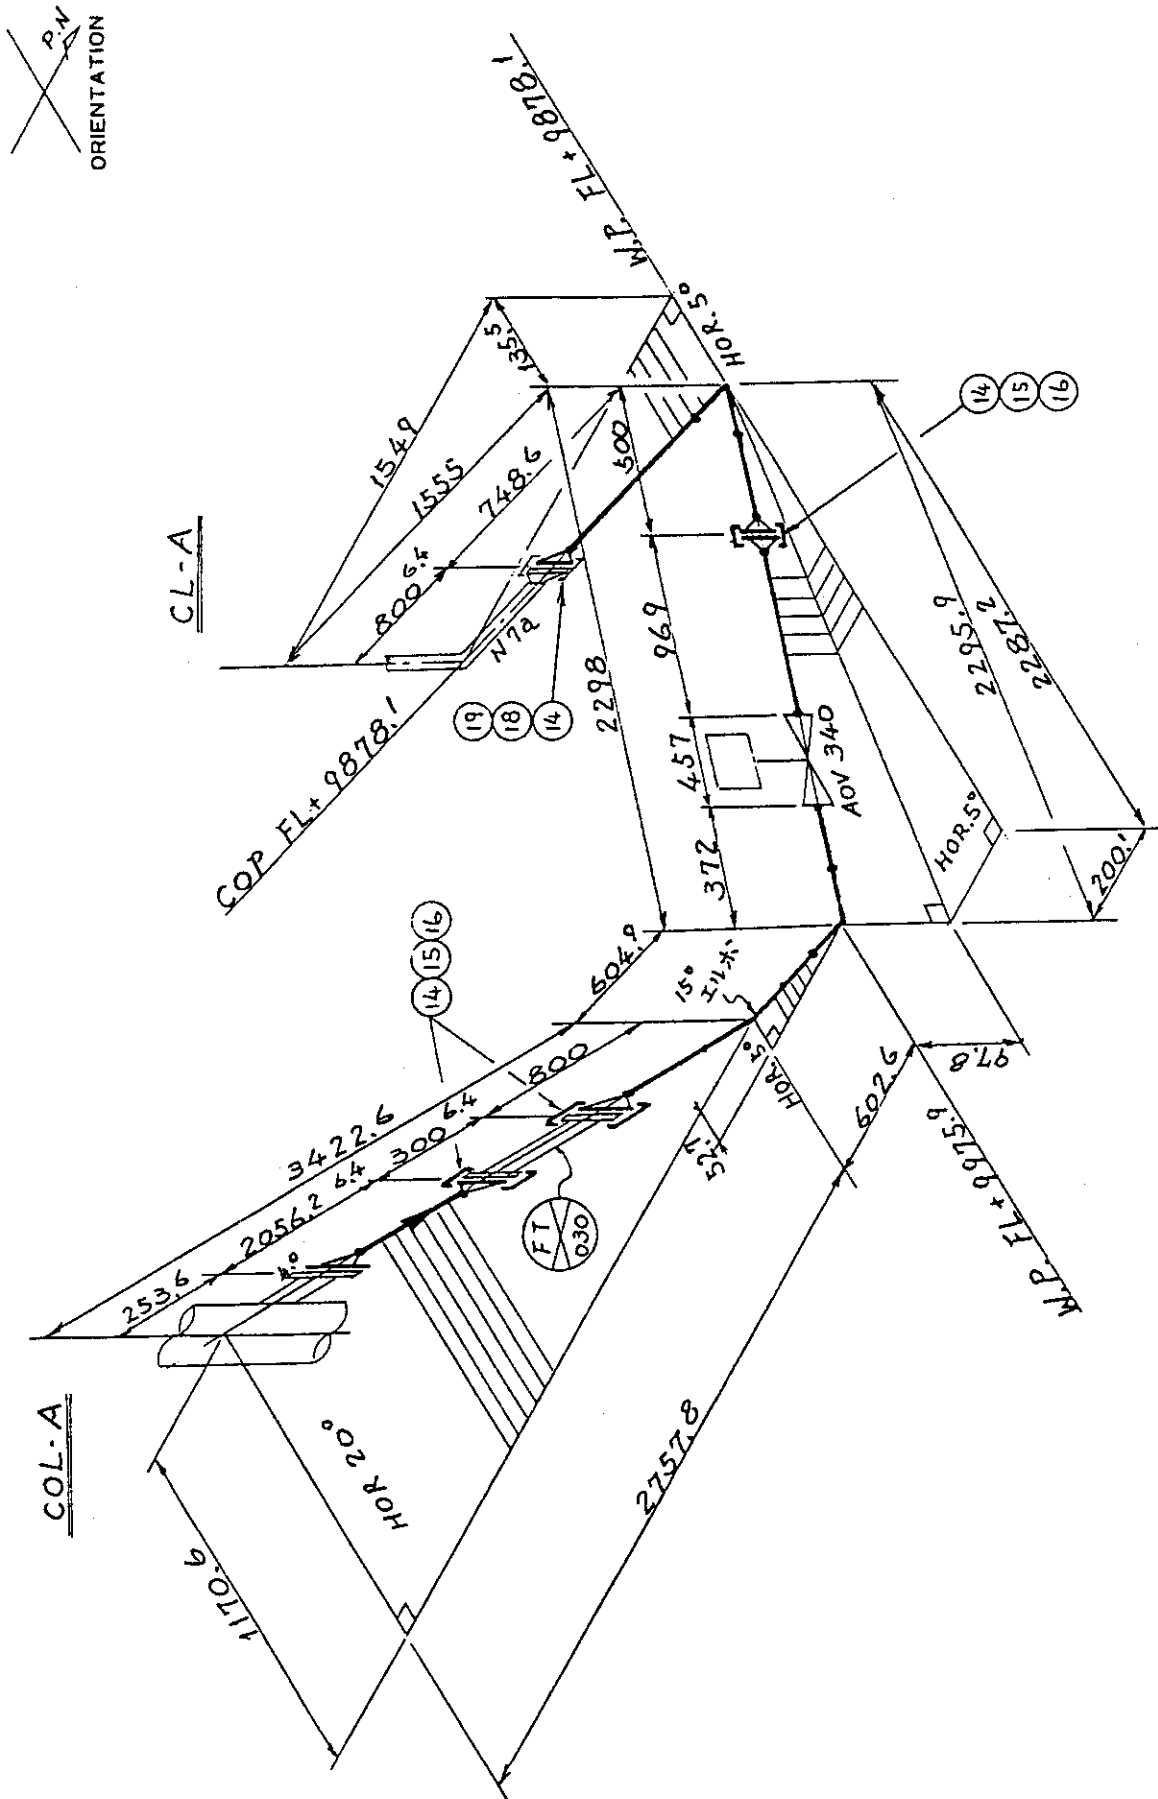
Piping Configuration for Loop A Pump Bypass Line
